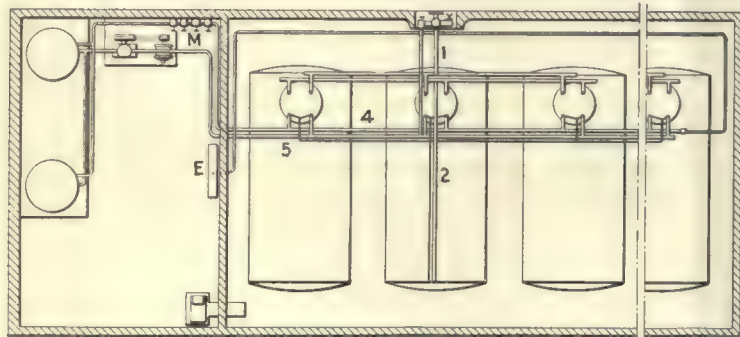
Plan and sections of fuel reservoirs, inert gas accumulator, piping, etc.
